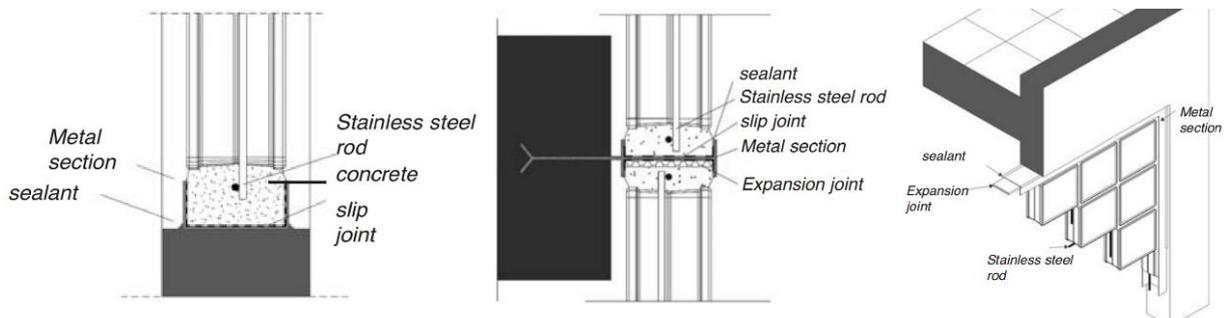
Restraining detail examples for glass brick installation with the traditional system (cement mortar) [4].
